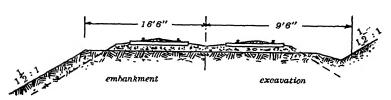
D Roadbed Stone or Gravel ballast Straight line-Double track
